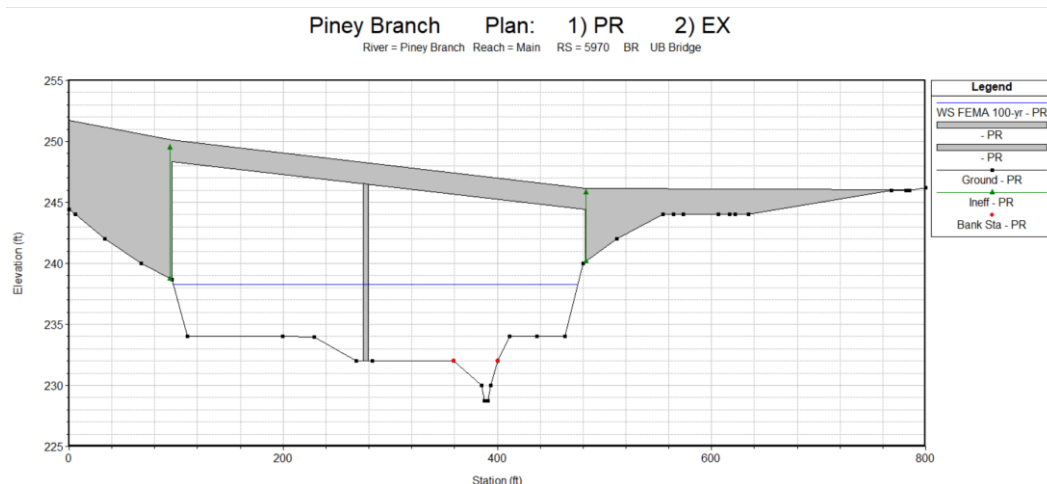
Bridge Upstream Internal Cross Section Proposed Geometry
